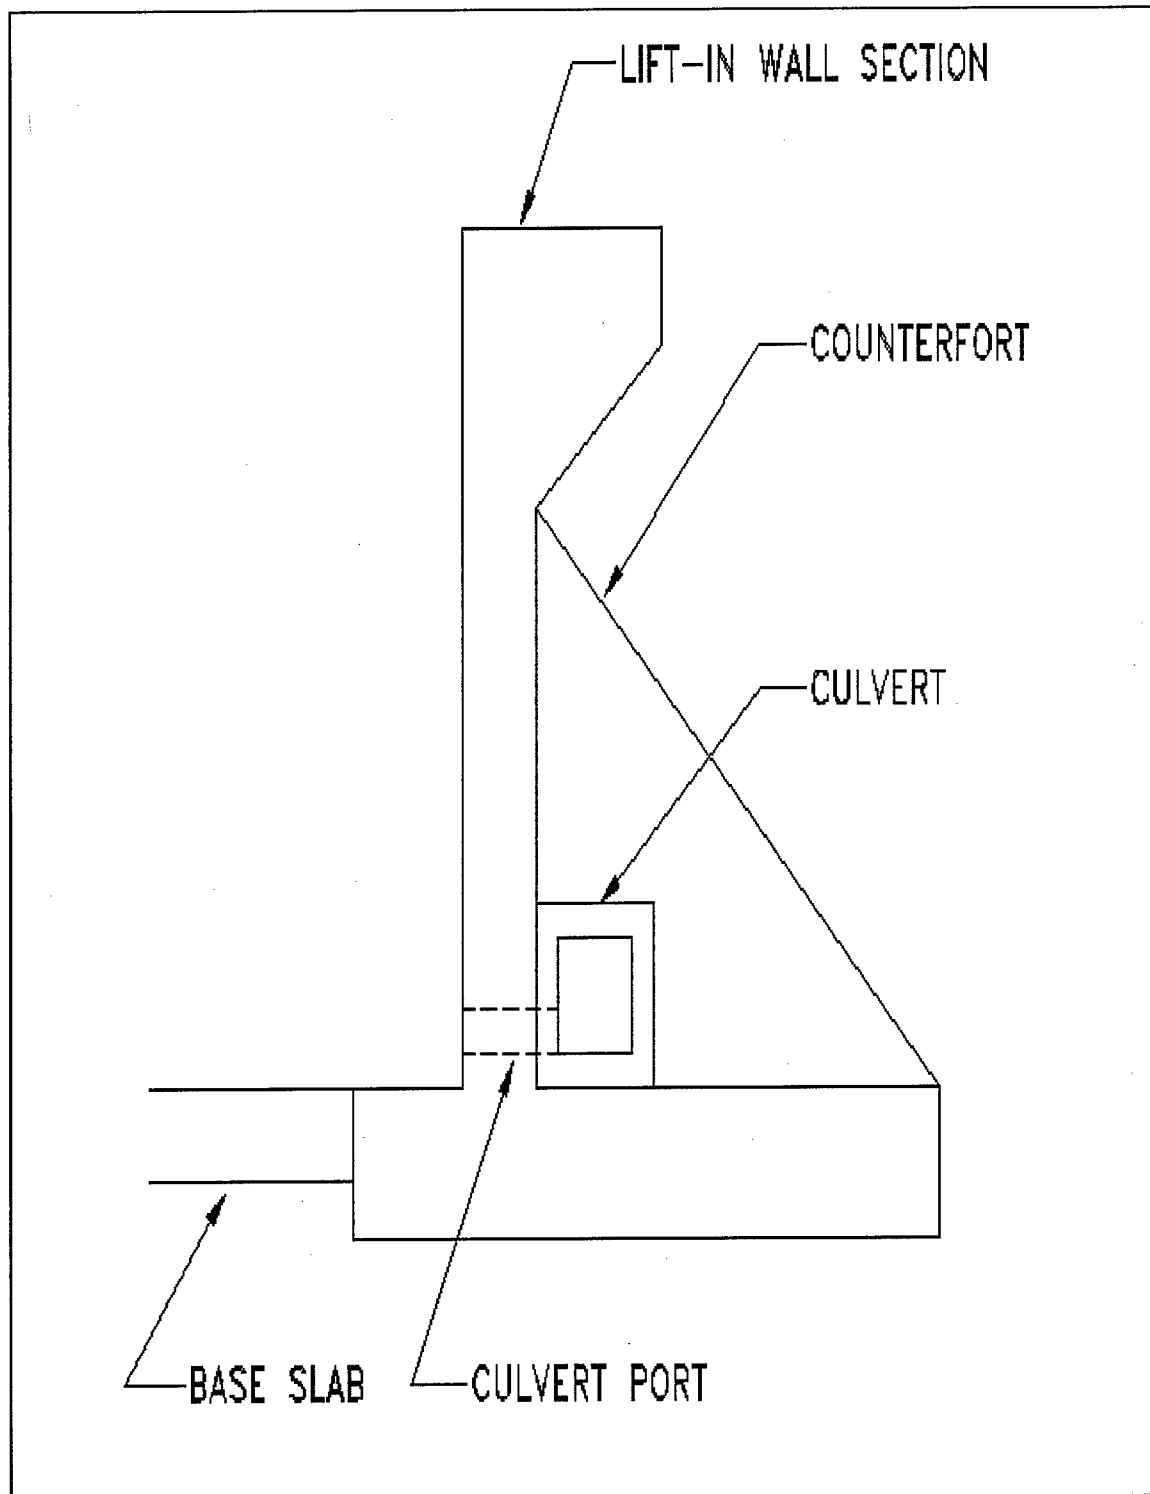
Plan 2 alternate, lift-in-place segmental wall with precast culvert
